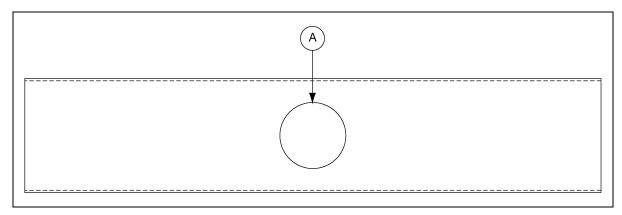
A Outlet Hole for Partial Drop-Out in Welded Steel and PVC Tubing (Used with Drop Kits and Drop Feeders)
